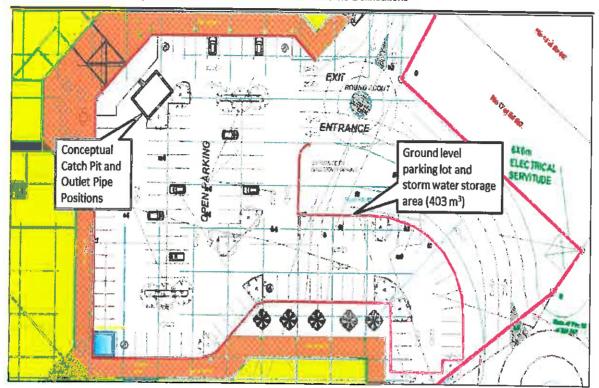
Conceptual Plan View of the Ground Level SWMP infrastructure
